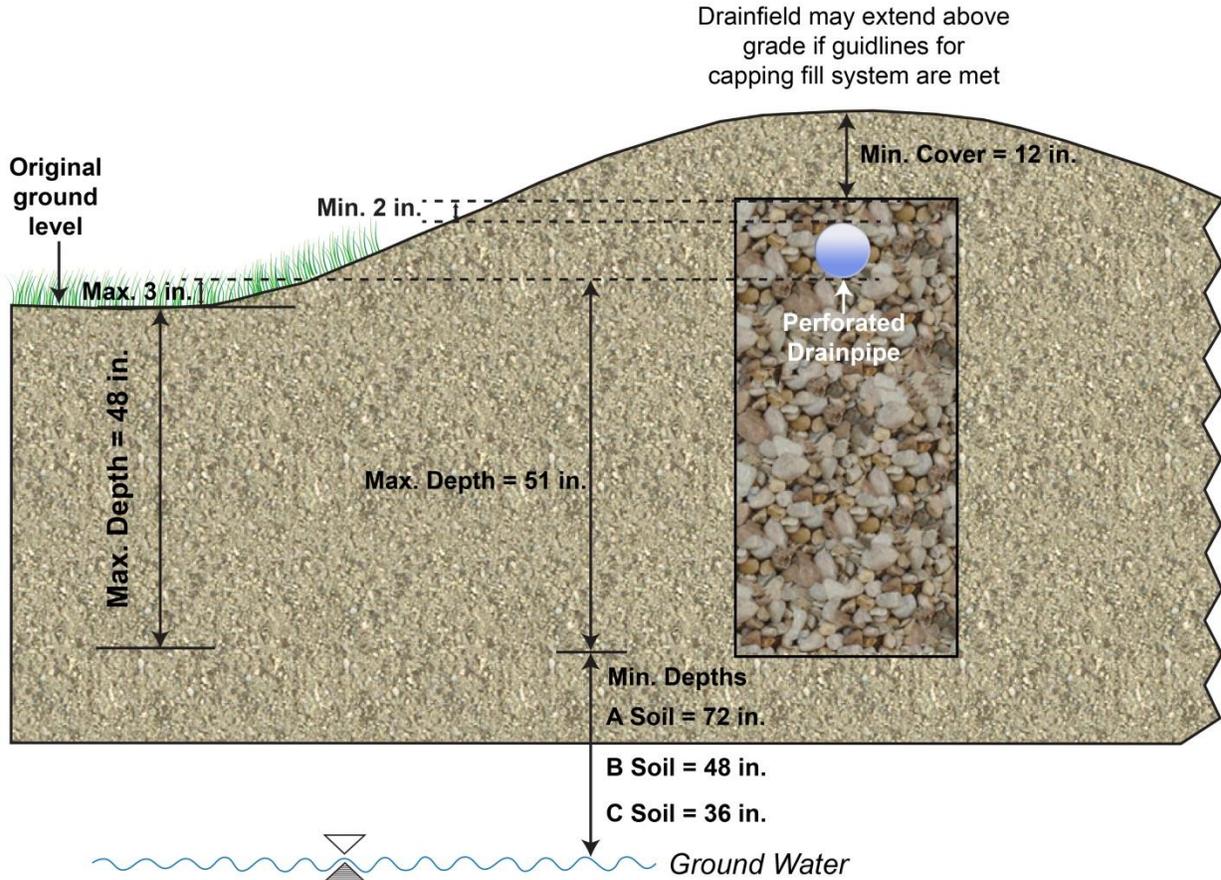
Cross section of an above-grade capping fill trench with extra drainrock.
